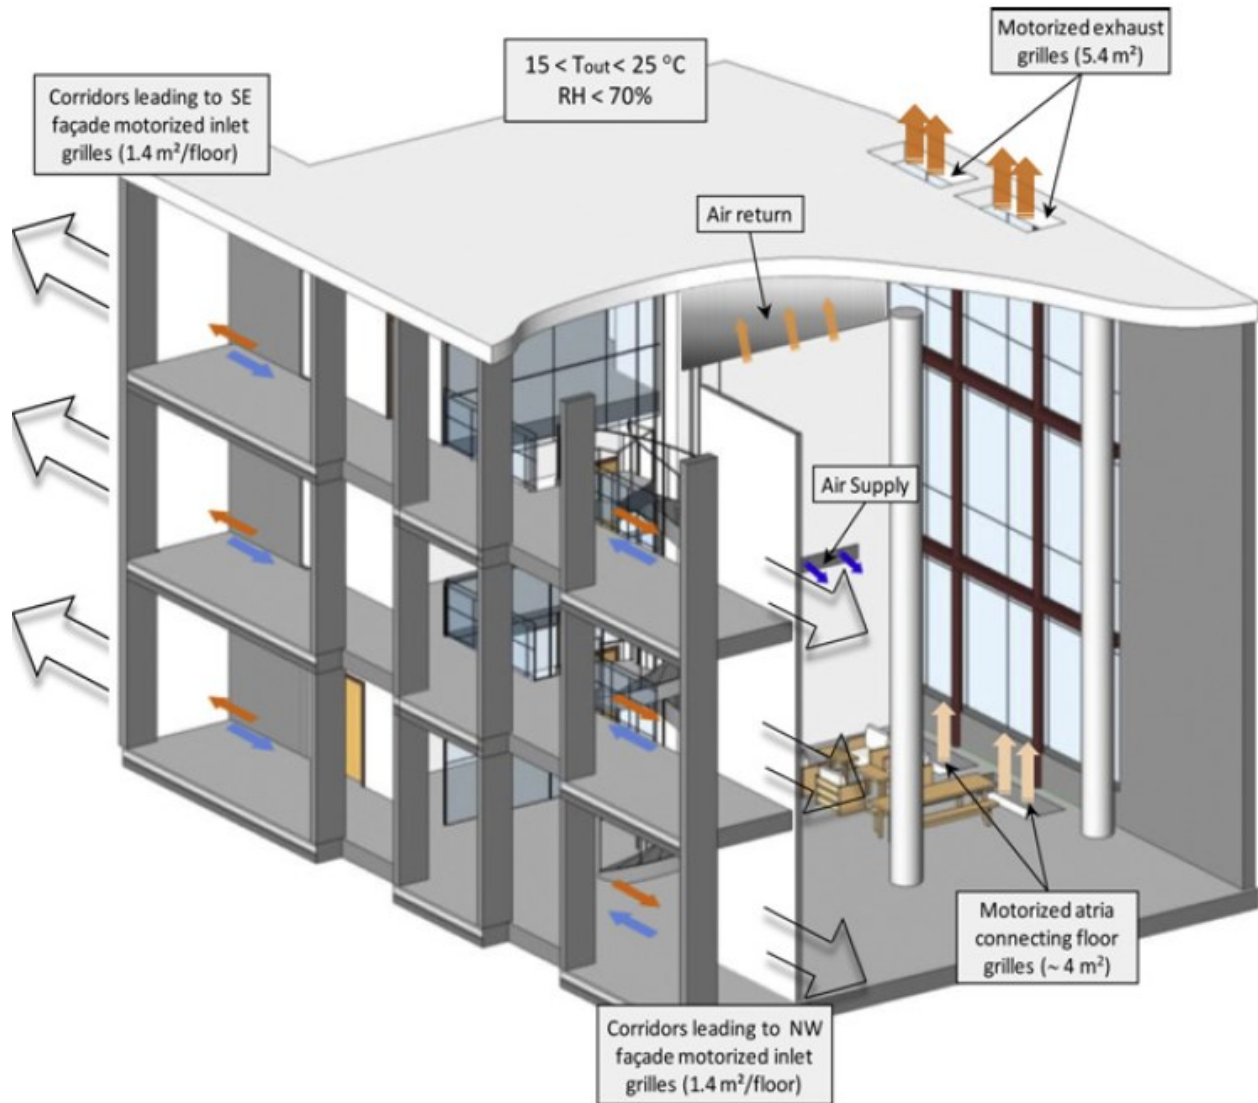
Hybrid ventilation system concept of EV building [43]
